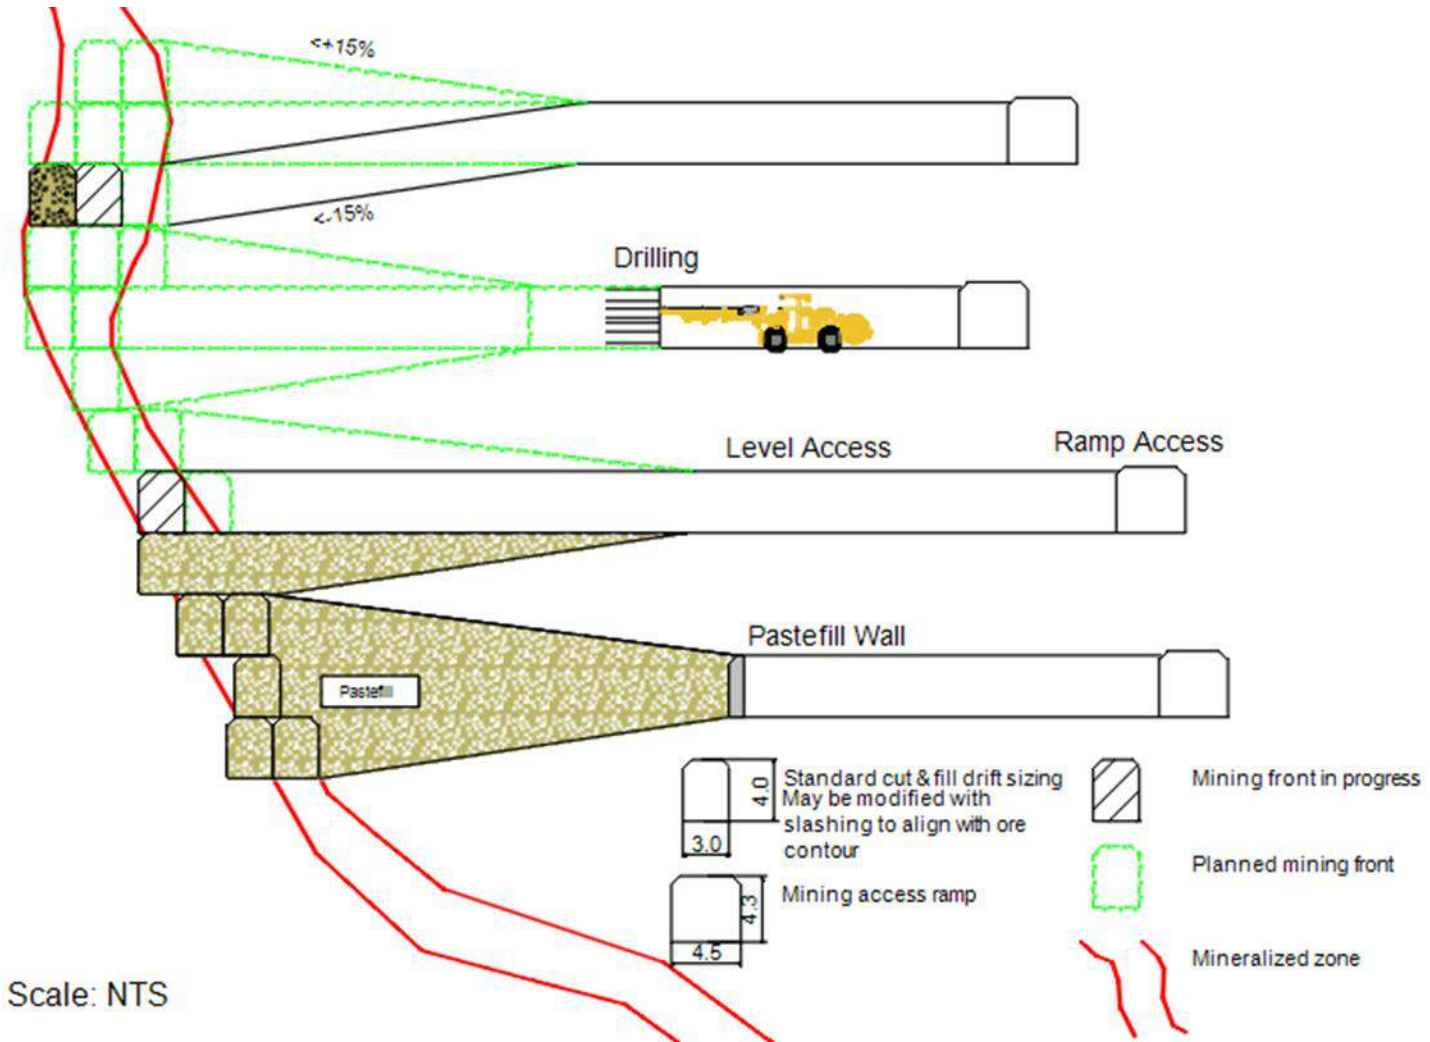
Long section view cut perpendicular to the strike of the orebody, showing the typical arrangement of the cut & fill method
